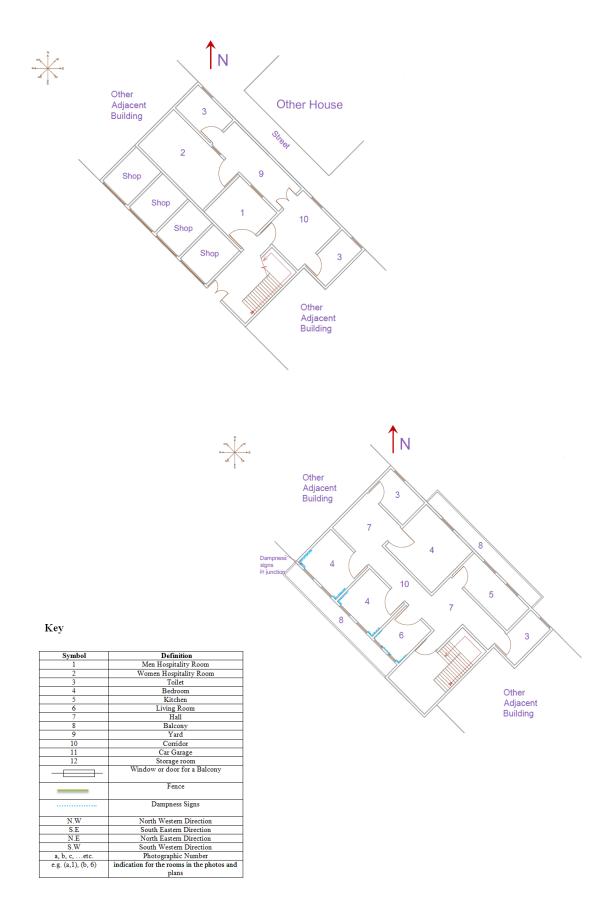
Ground floor and first floor plan of house 2, West Albeida quarter, Albeida, Green Mountain, Libya
